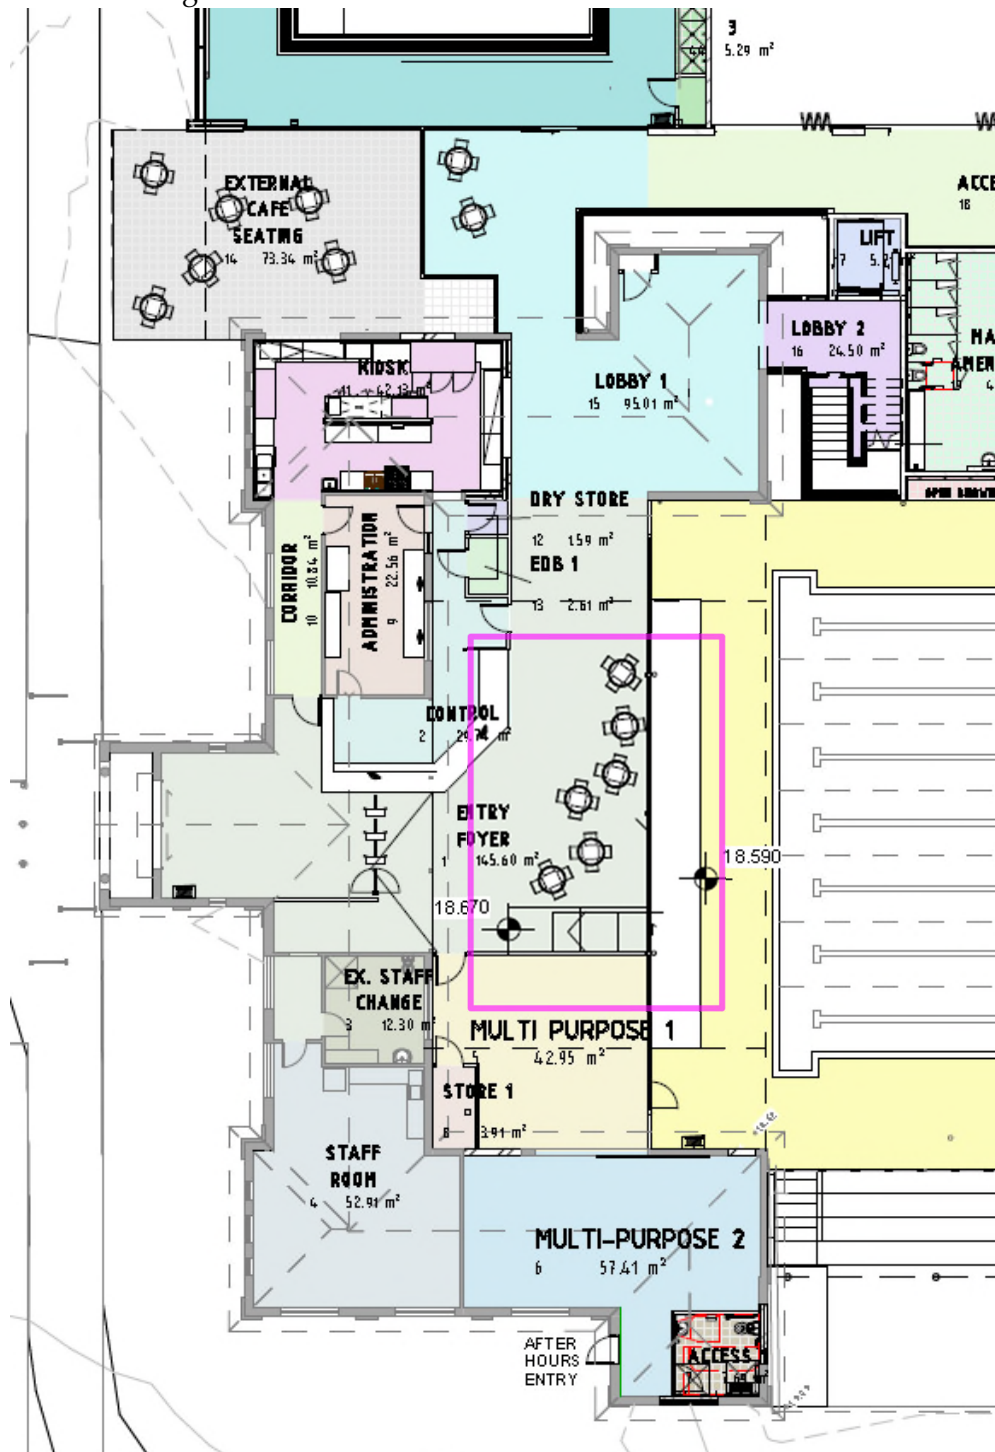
Proposed New DA 2019 Ground Floor Plan detail showing addition with new separate roof form over extended Entry Foyer / Reception Area. The existing wading pool would be infilled. (Pink Outline)
